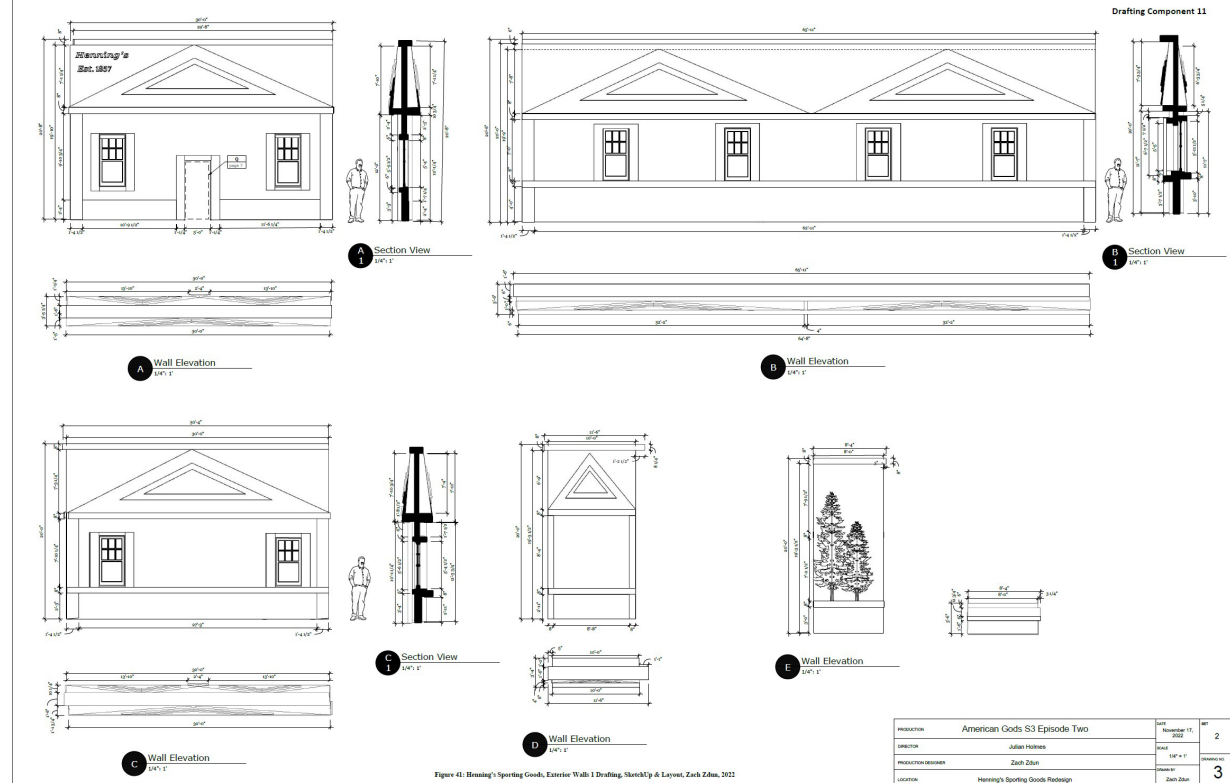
Henning's Sporting Goods, Exterior Walls 1 Drafting, SketchUp & Layout, Zach Zahn, 2022
